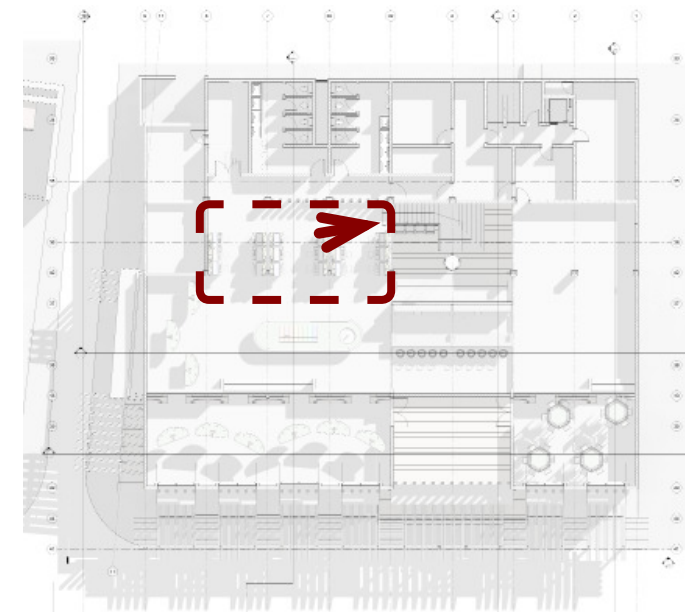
First floor plan of gaming facility Showing services and prive.
